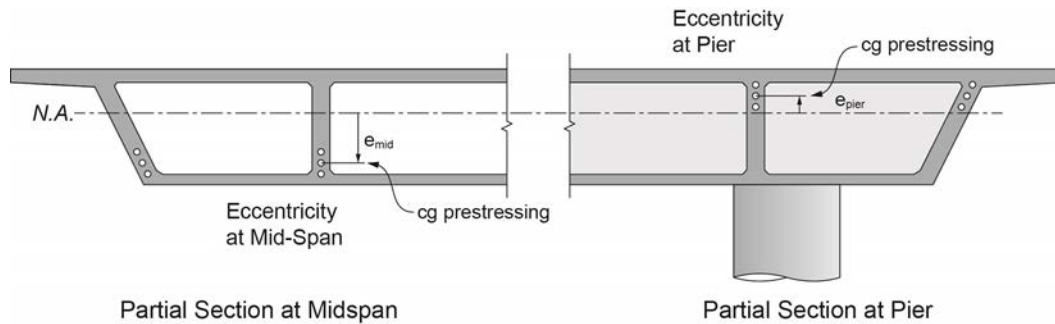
Tendon Locations within Box Girder Cross Section
